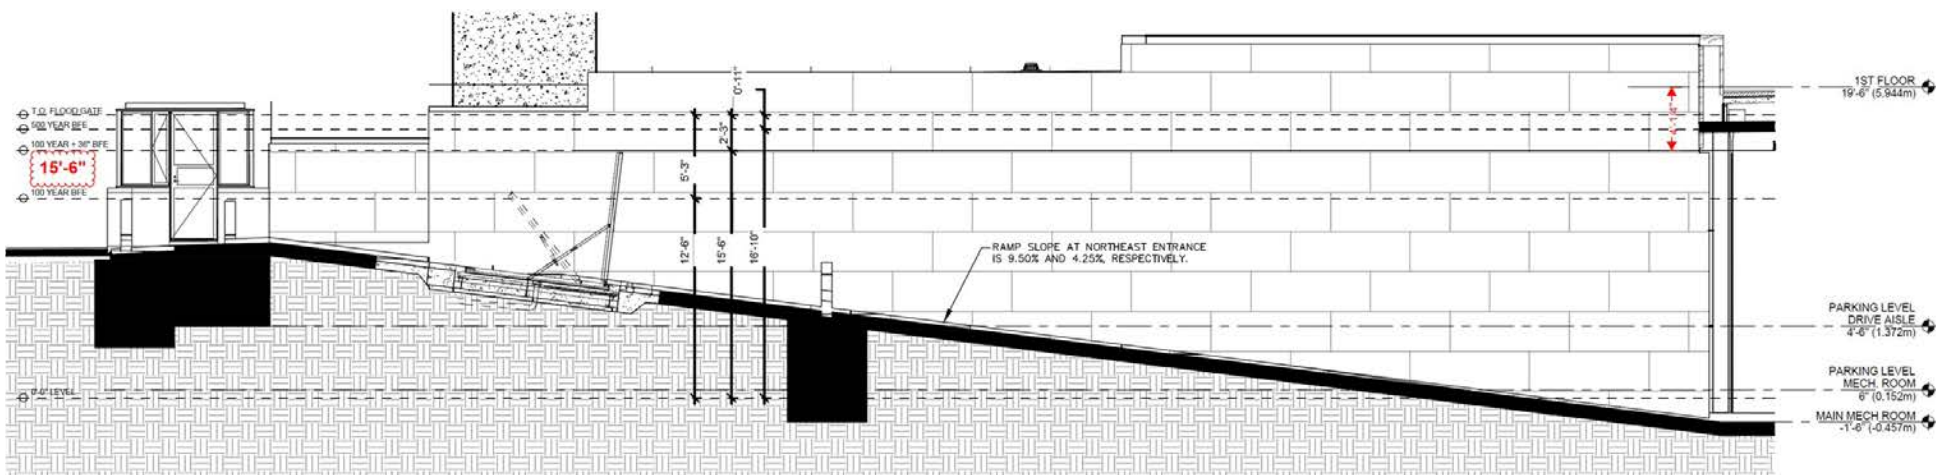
Flood Gate and Ramp Section from Revitalization Project
